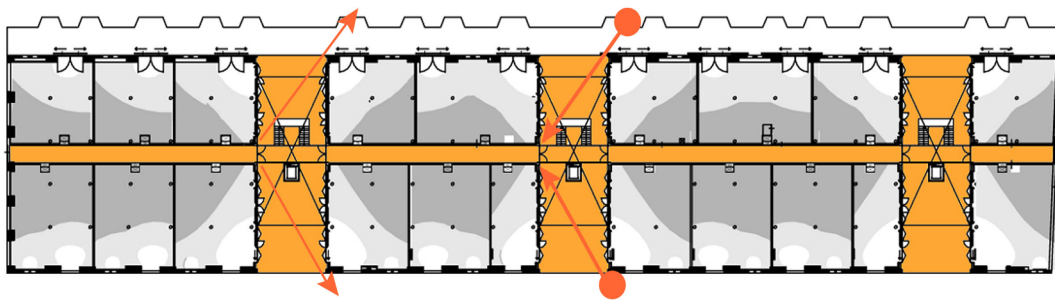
Jobsveem - Floor plan after the creation of the three atria due to daylight requirements
